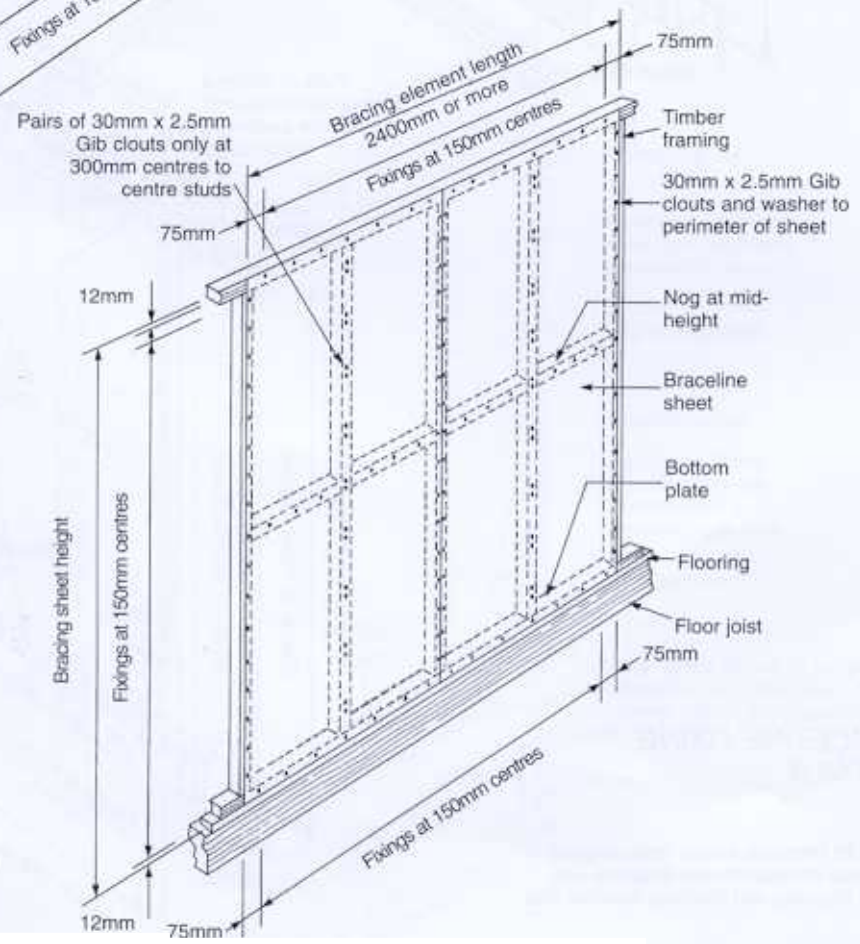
HARDITEX™ / BRACELINE GROUP NAILING DETAIL TO TIMBER JOISTS (System HT13B)
